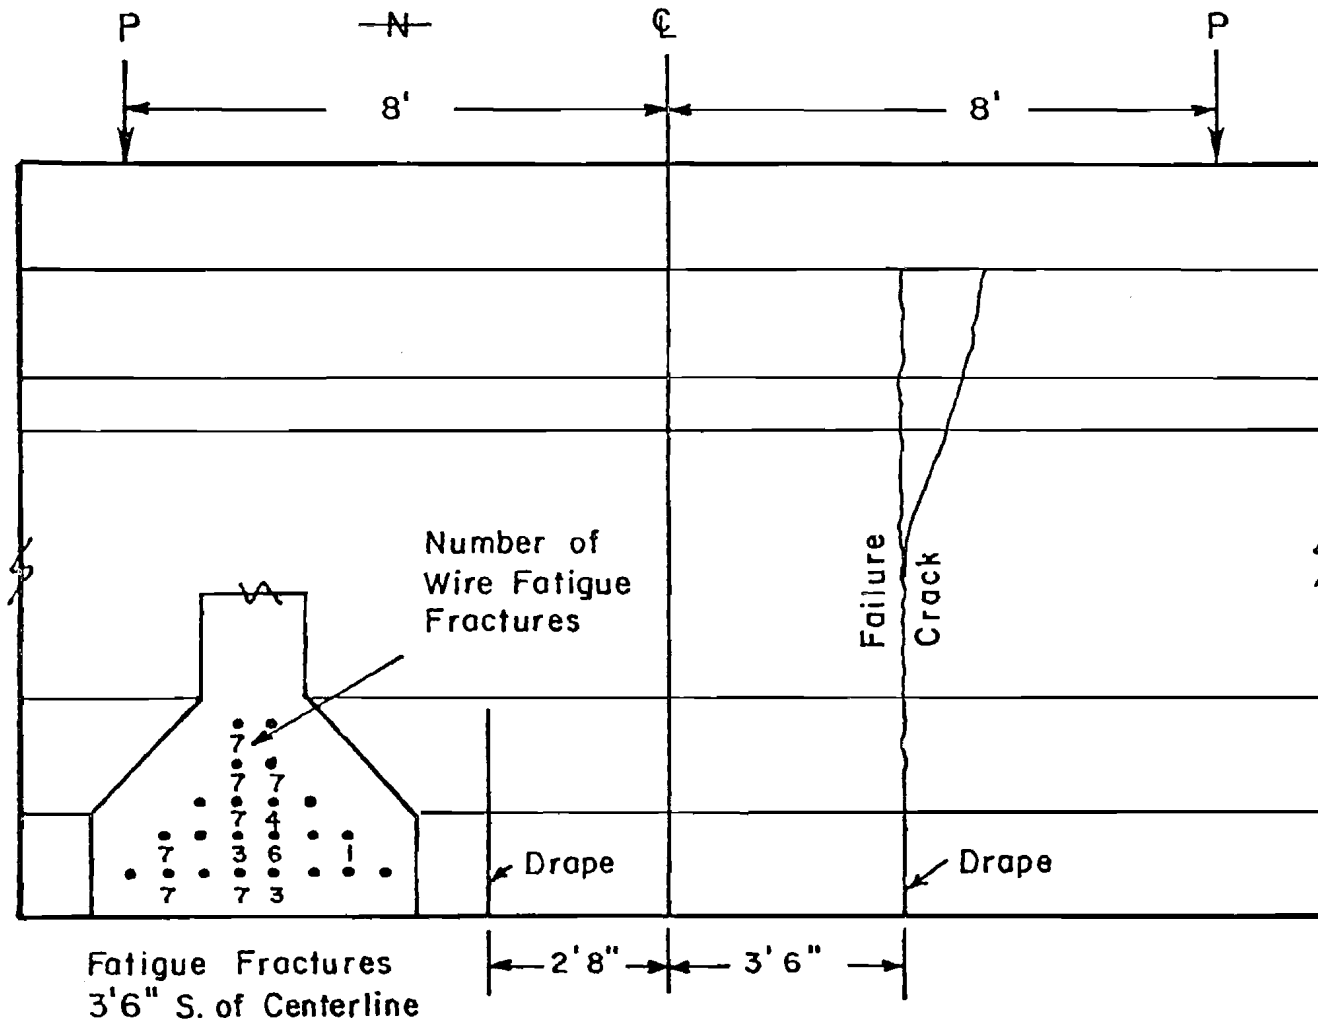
Location of drape points and fatigue fractures for Specimen A-22-NP-6.2-OL-2.84
